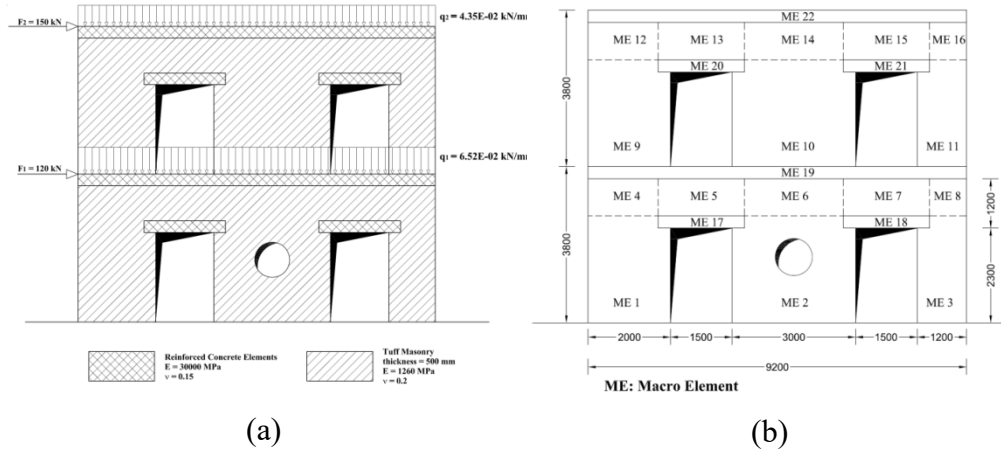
Masonry wall example: a) geometry and loads; b) macro-element subdivision
